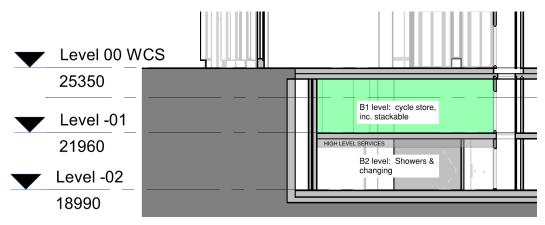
proposed section view of showers at B2 level and cycle storage at B1 level of 1 Museum St basement
